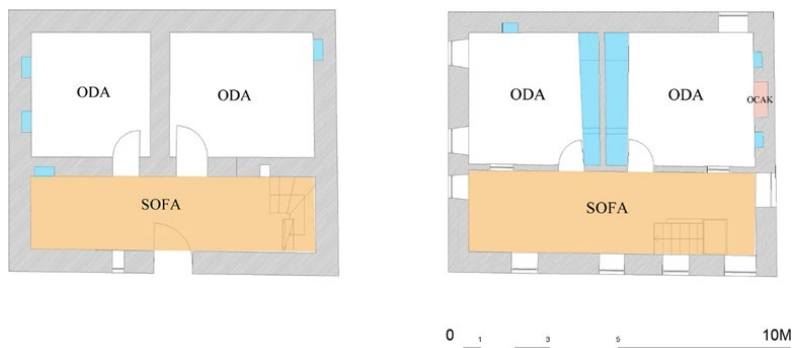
Plan type with “front sofa”; ground and first floor plans.
